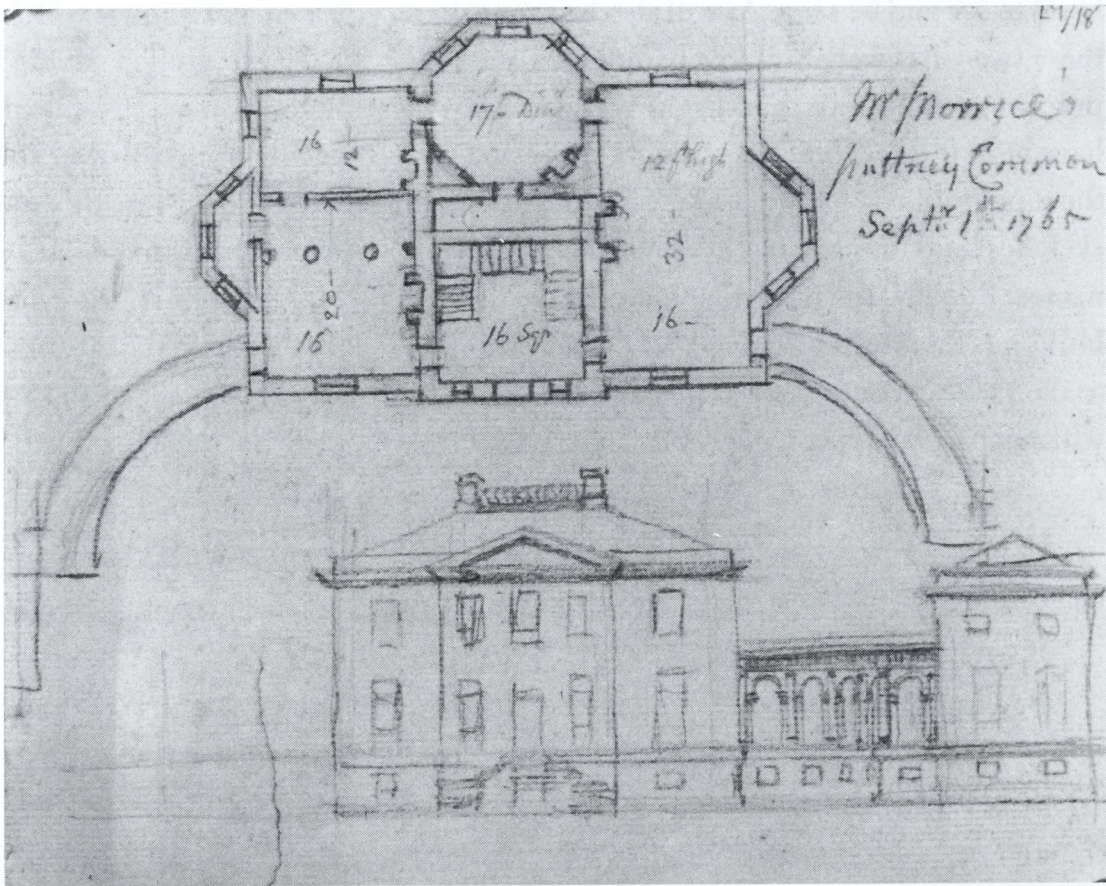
William Newton, Sketch plan and south elevation of ‘Mr Morrice’s Putney Common, Sept^r. 1st. 1765.’
